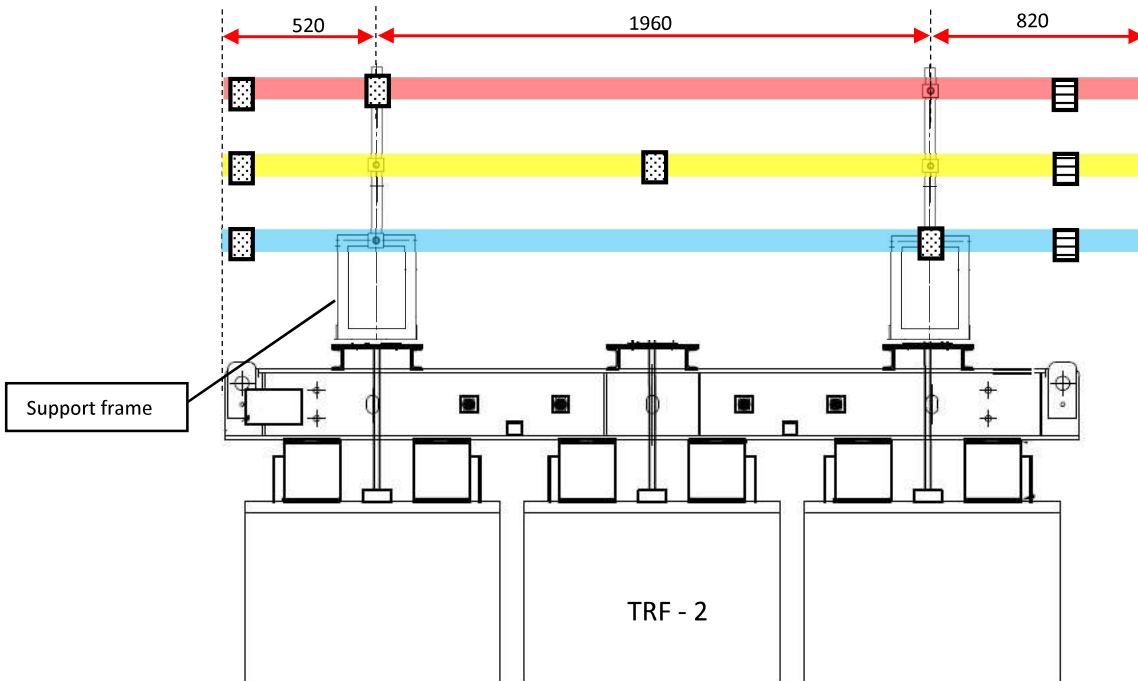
Front view showing busbar layout and mounting detail for TRF -2
